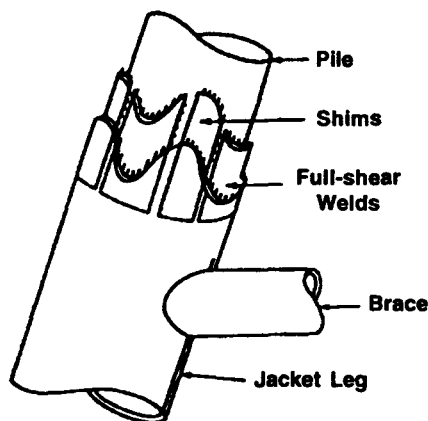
Scalloped Welded Connection for Transfer of Load Between Pile and Jacket
